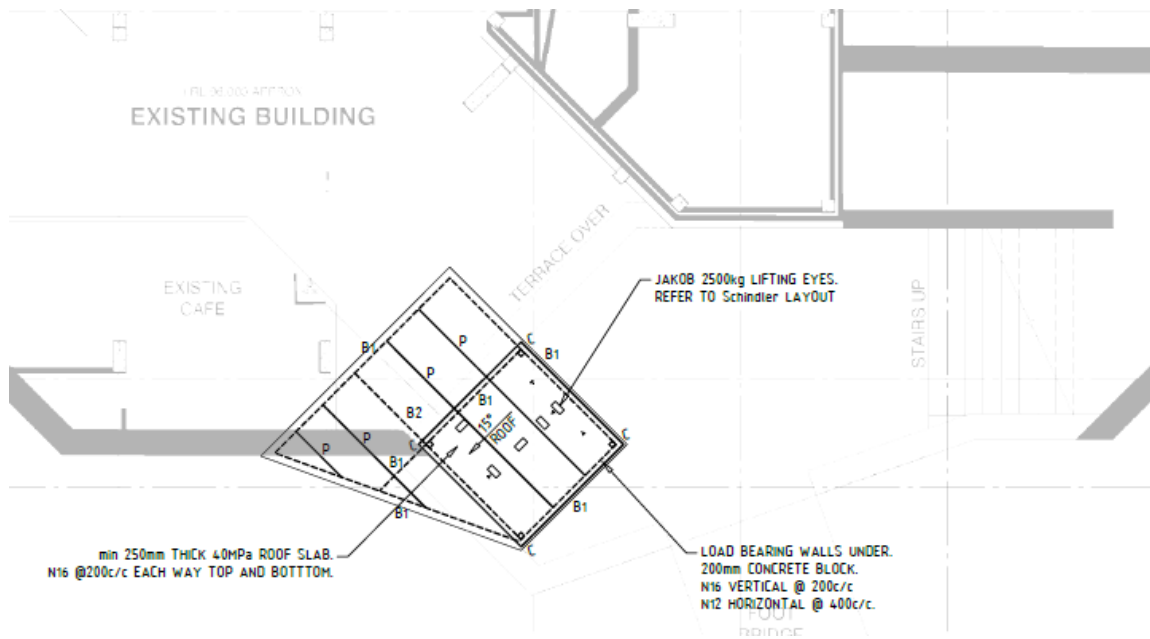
| Roof Plan for the proposed lift (Source: Applicant's documentation)
